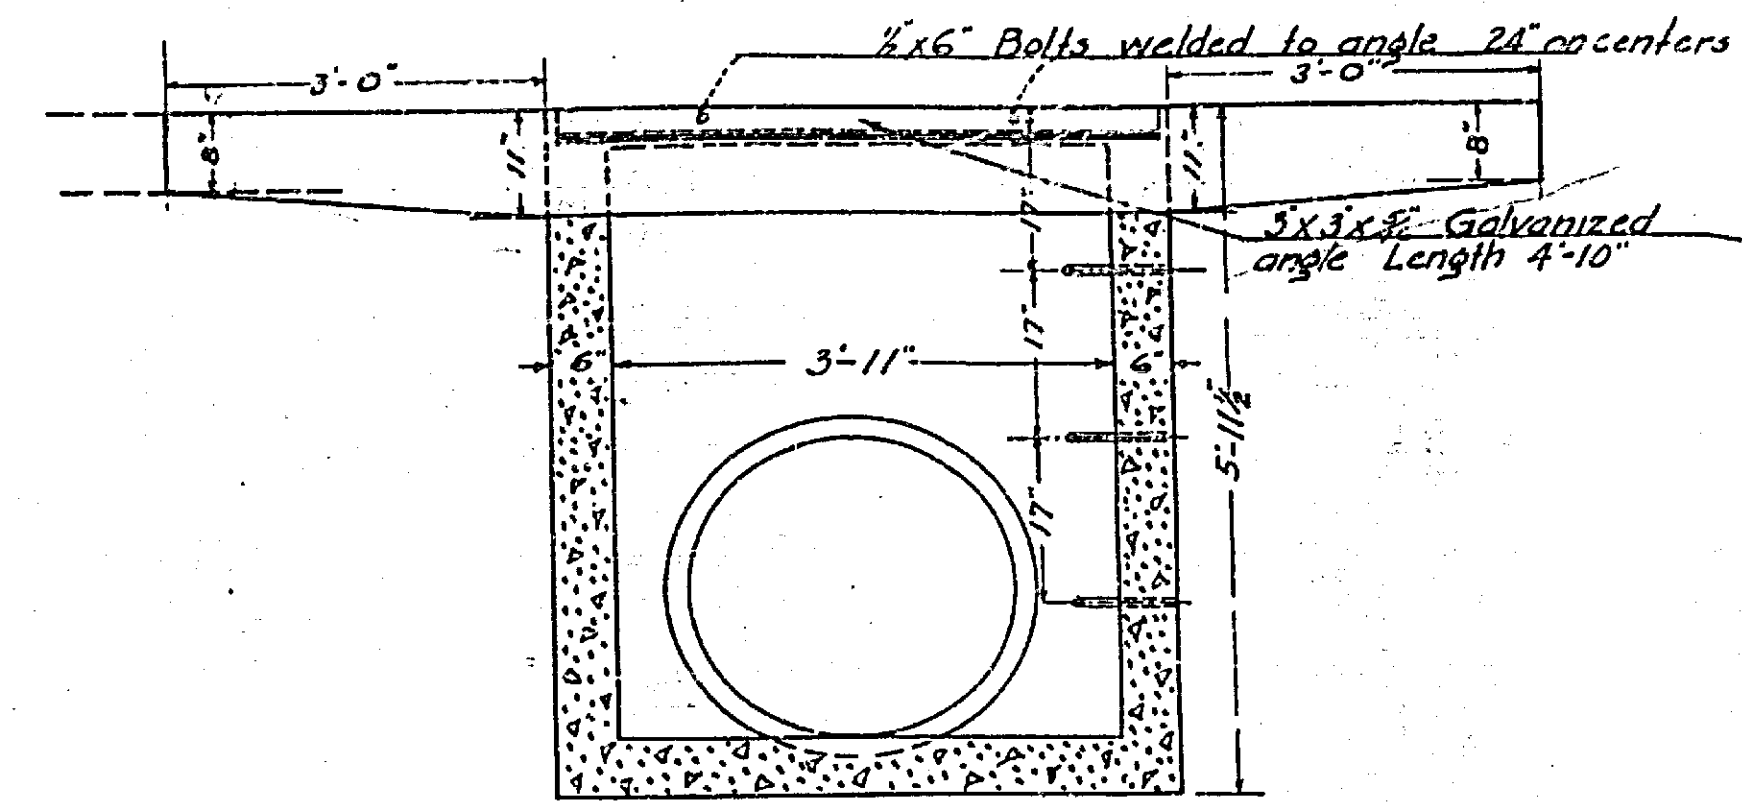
# DETAIL OF REINFORCED CONCRETE CATCH BASINS
